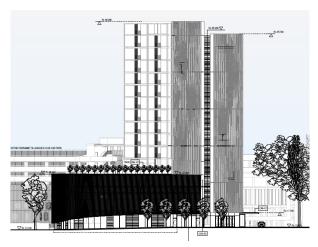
Southwest elevation (toward OGH) (Source: Hassell 2021).
